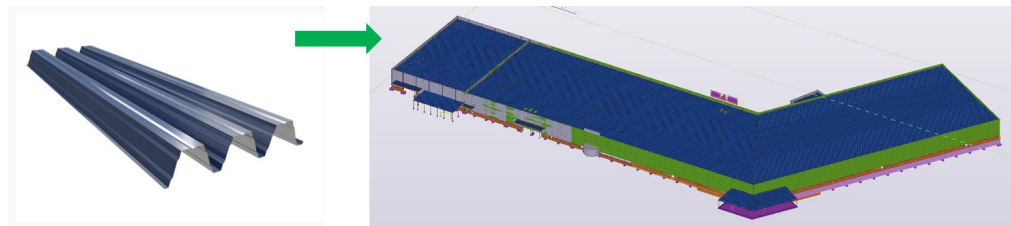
Ruukki Corrugated steel panel is used in Project: Ruukki Birsta Handel (Sweden)
